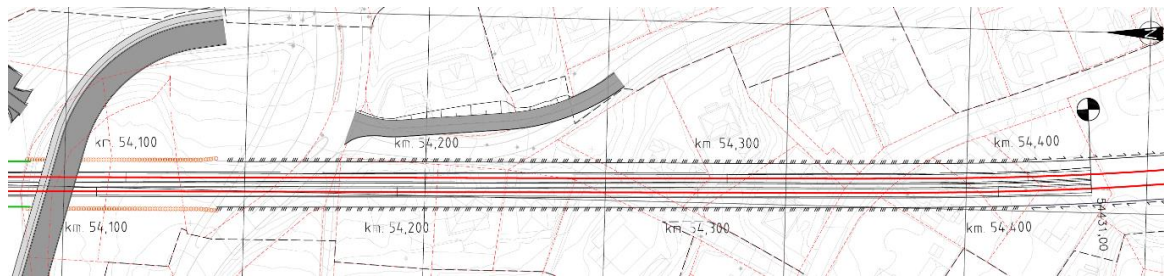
Plan overview for soil tunnel alignment from (NIRAS, 2020)
